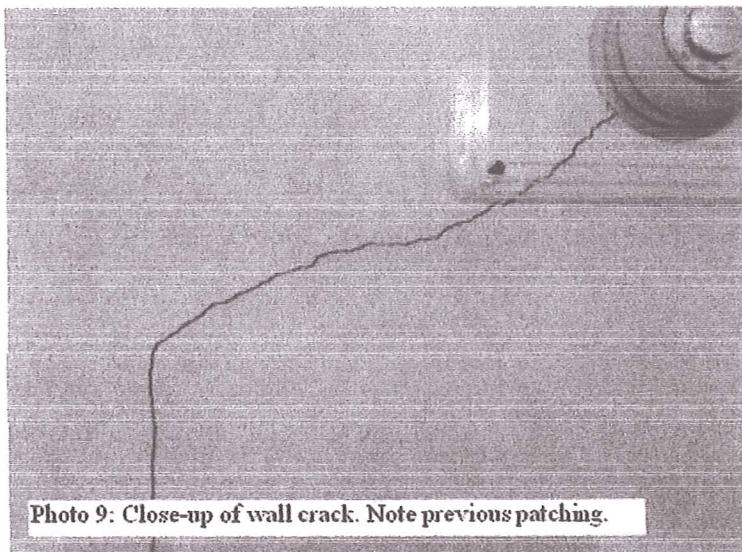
Close-up of wall crack. Note previous patching.
